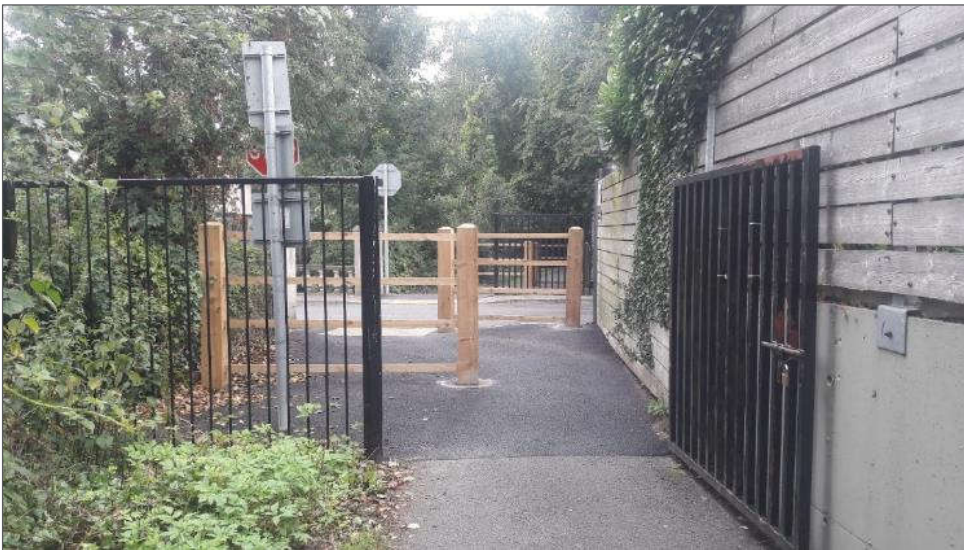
Exit from Páirc an Phobail at Rankin's Wood (looking north).
